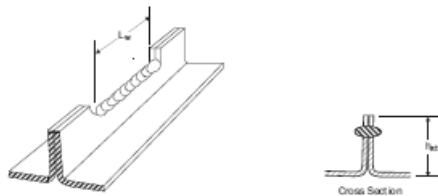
Top Seam Weld - Back-to-Back Vertical Leg Joint
